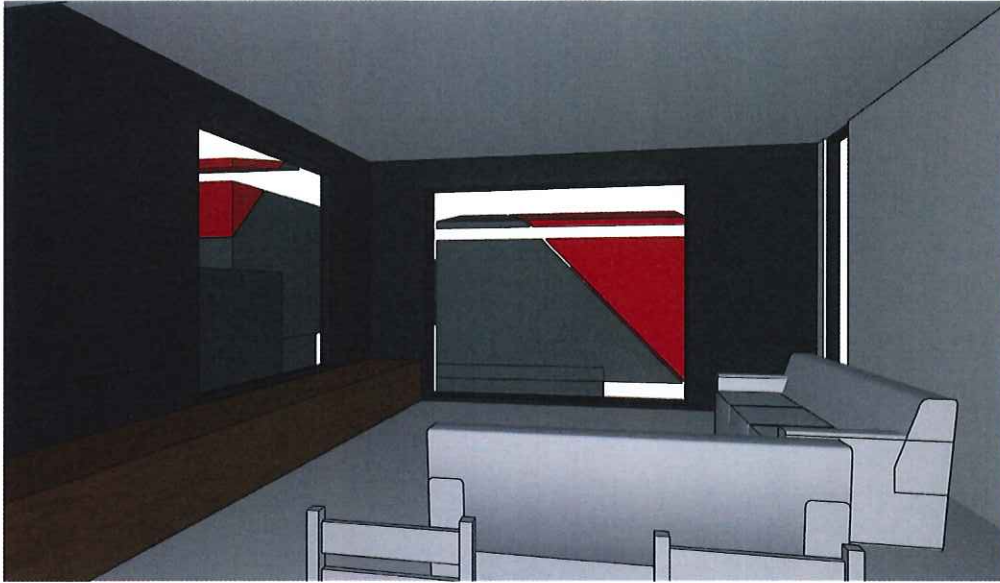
LIVING ROOM VISUAL BULK (WITHIN BUILDING ENVELOPE)
